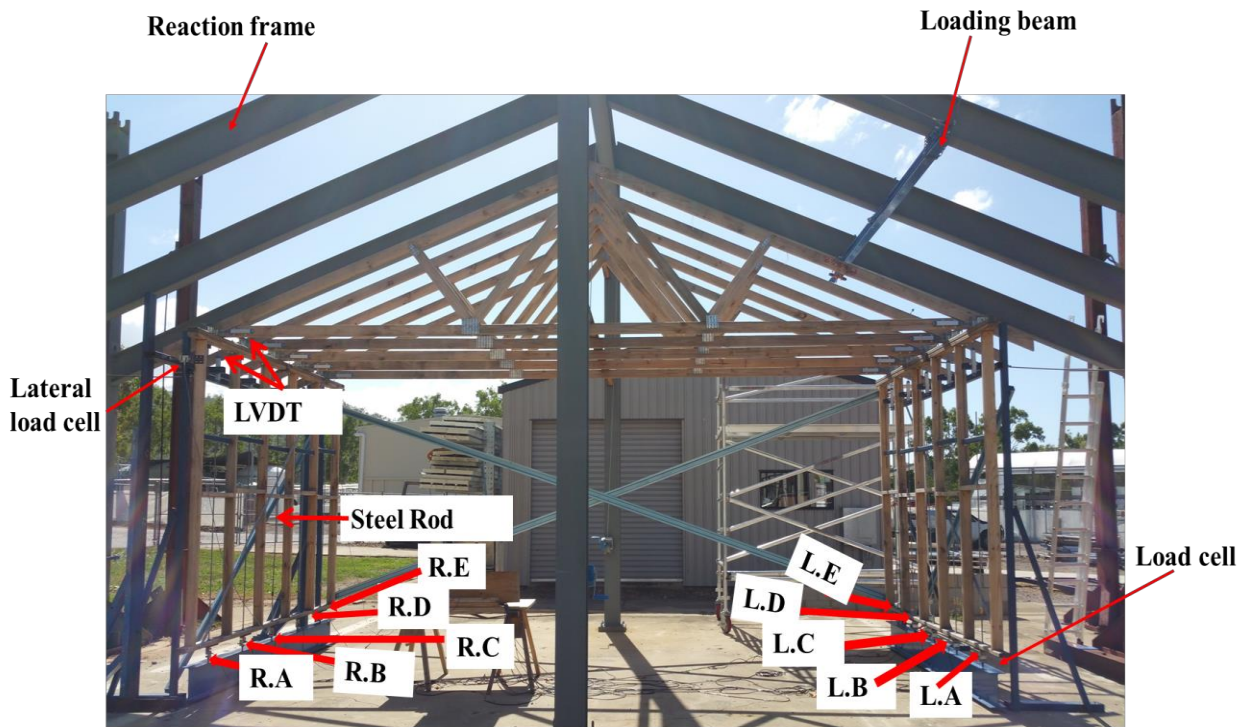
Full-scale test house at Stage 1 and the load cell locations
